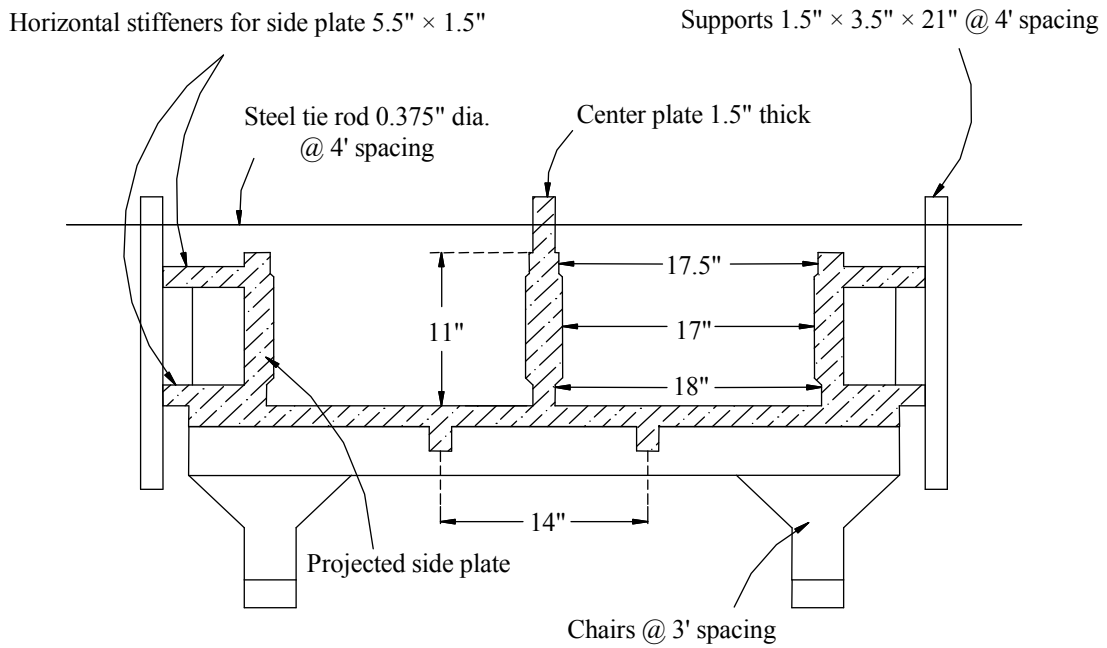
Cross-section of the formwork for the interior box-beams.
